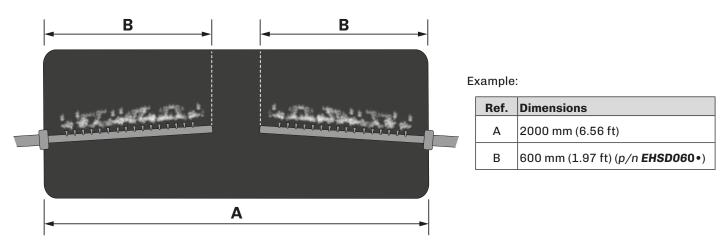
Horizontal installation in a wide duct - 2 distributors
